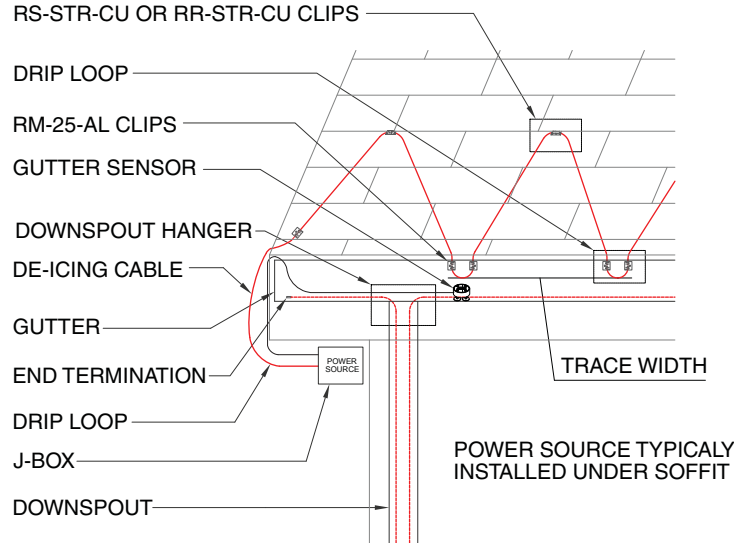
De-icing cable on sloped slate eave only. This layout typically uses RS-STR-CU or RR-STR-CU clips on roof eave and RM-25-AL clips with VHB adhesive pads in gutter. For copper gutters use RM-25-CU clips.
